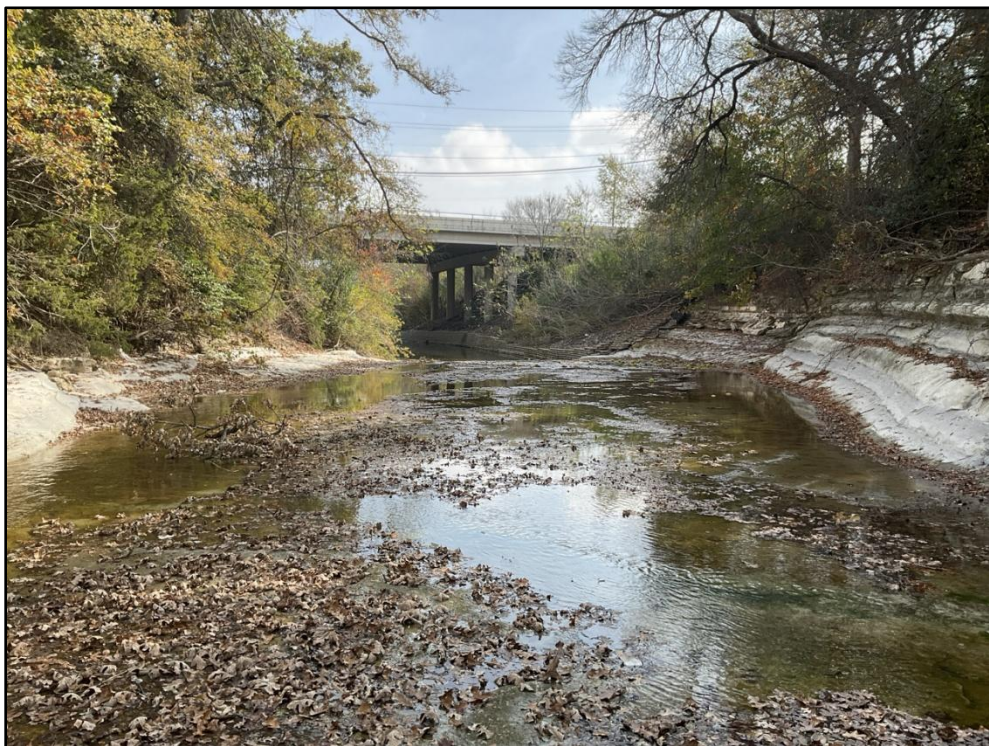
STA 64+50 – Looking downstream at the location of Tenmile Creek cross section 2.
